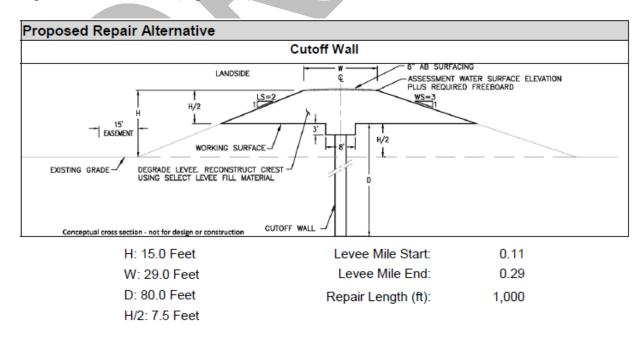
Proposed Cutoff Wall Specifications for Repair of Critical Seepage Site within RD 755 (URS, 2013b)
